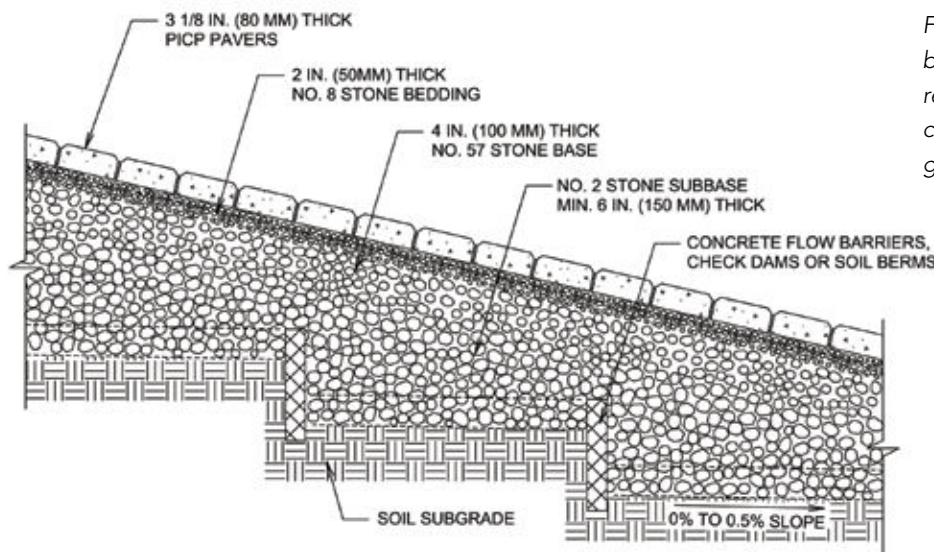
PICP with barriers that form stepped reservoirs. Barriers can be constructed of geomembrane or concrete.
